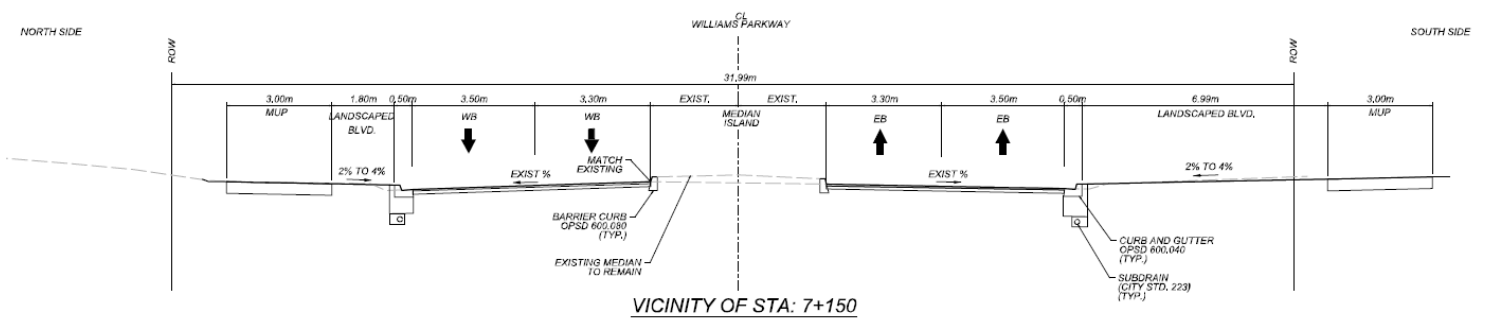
PROPOSED CROSS-SECTION, WEST OF DIXIE
